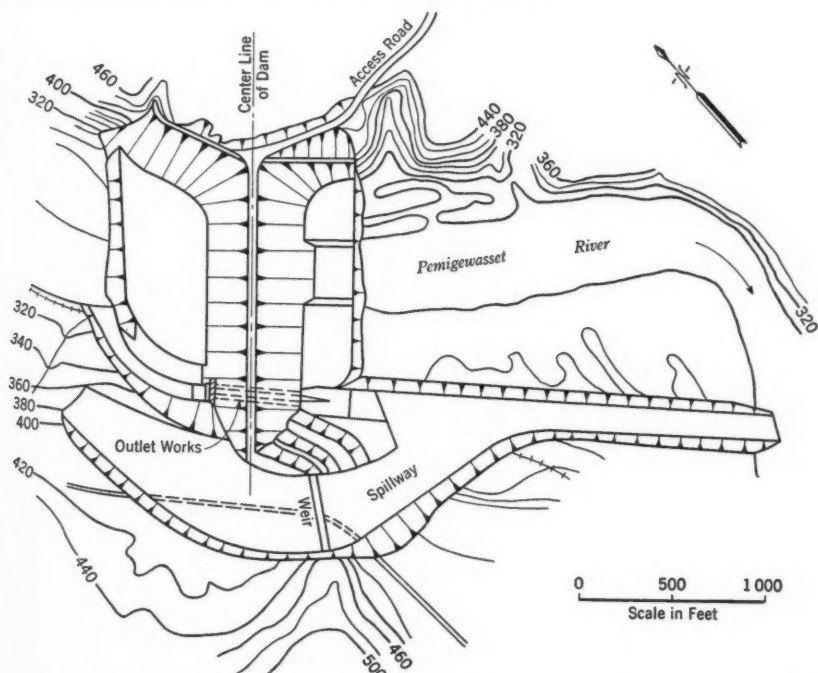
LOCATION PLAN, FRANKLIN FALLS DAM ON THE PEMIGEWASSET RIVER, FRANKLIN, N. H.
